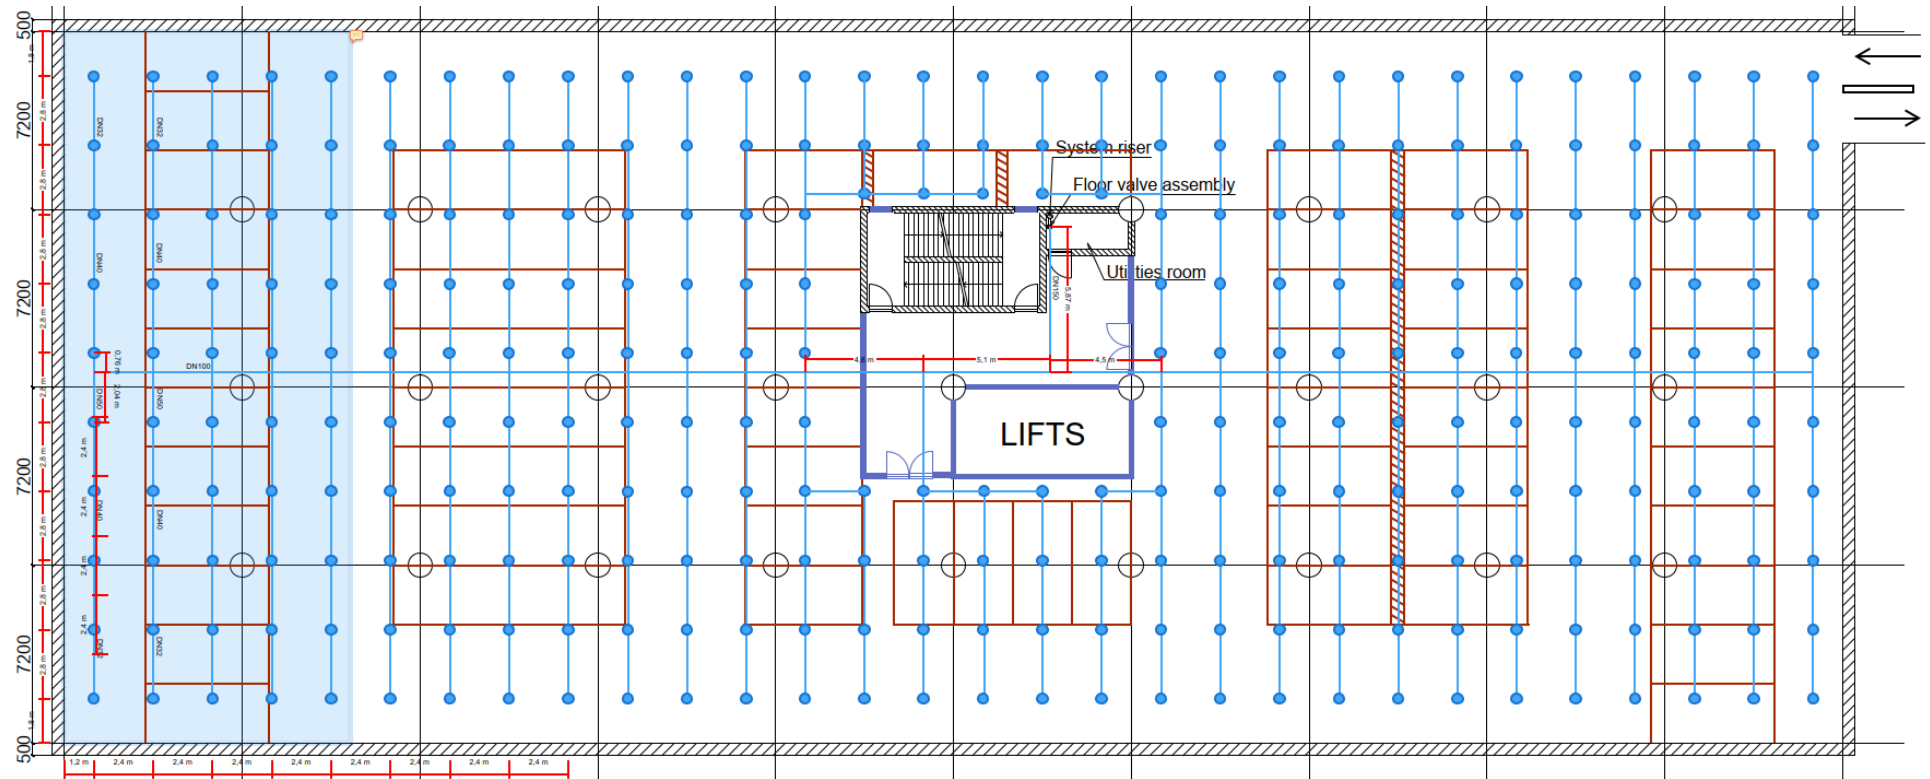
Detailed design of the FM Global system for Scenario 3: Underground parking garage
